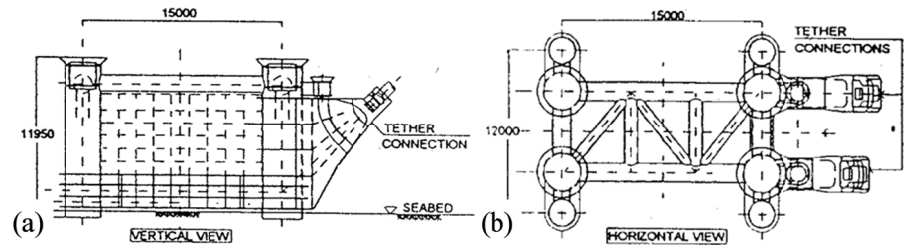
Steel framed cap of the piled foundation of an SFT anchoring group (Nicolussi and Casola, 1994).
